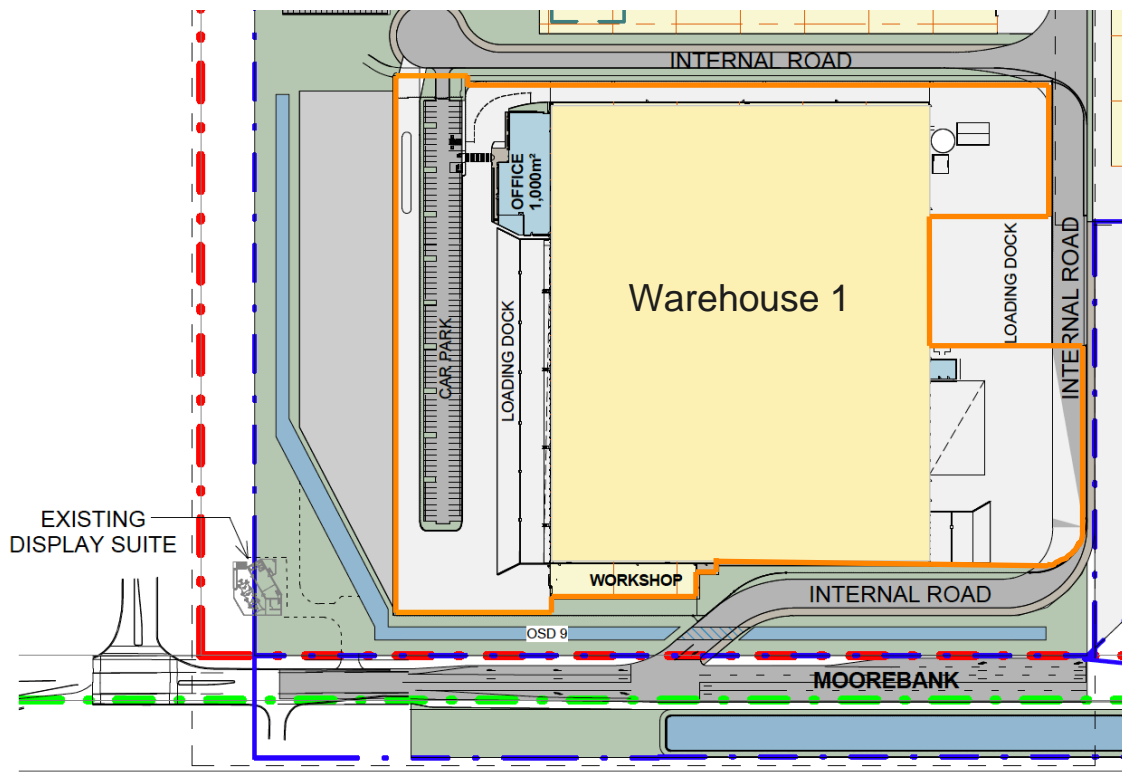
WH1 site layout within the WH1 lease area (orange boundary)
